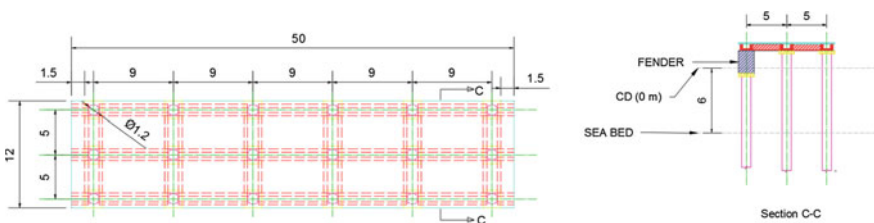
Plan and elevation of Type 1 structure (slope fill system) (all dimensions in “m”)
